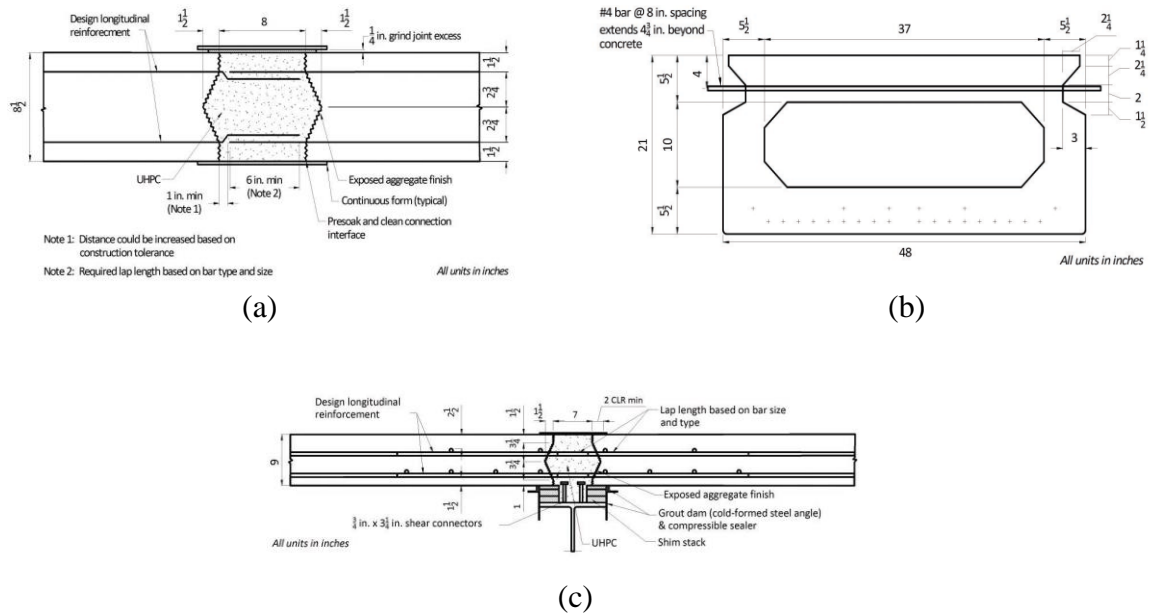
(a) UHPC connection between precast deck panels as deployed by NYSDOT on CR47 over Trout Brook, (b) UHPC adjacent box beam connection detail, and (c) combined UHPC deck-level and composite connections as deployed by NYSDOT on I-81 near Syracuse, NY [4]
